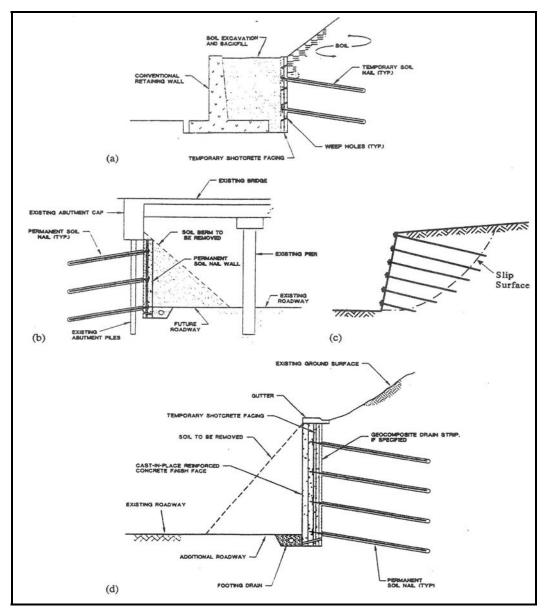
, In-Situ Reinforced (Soil Nail) Walls (Earth Retaining Structures – June 2008)
